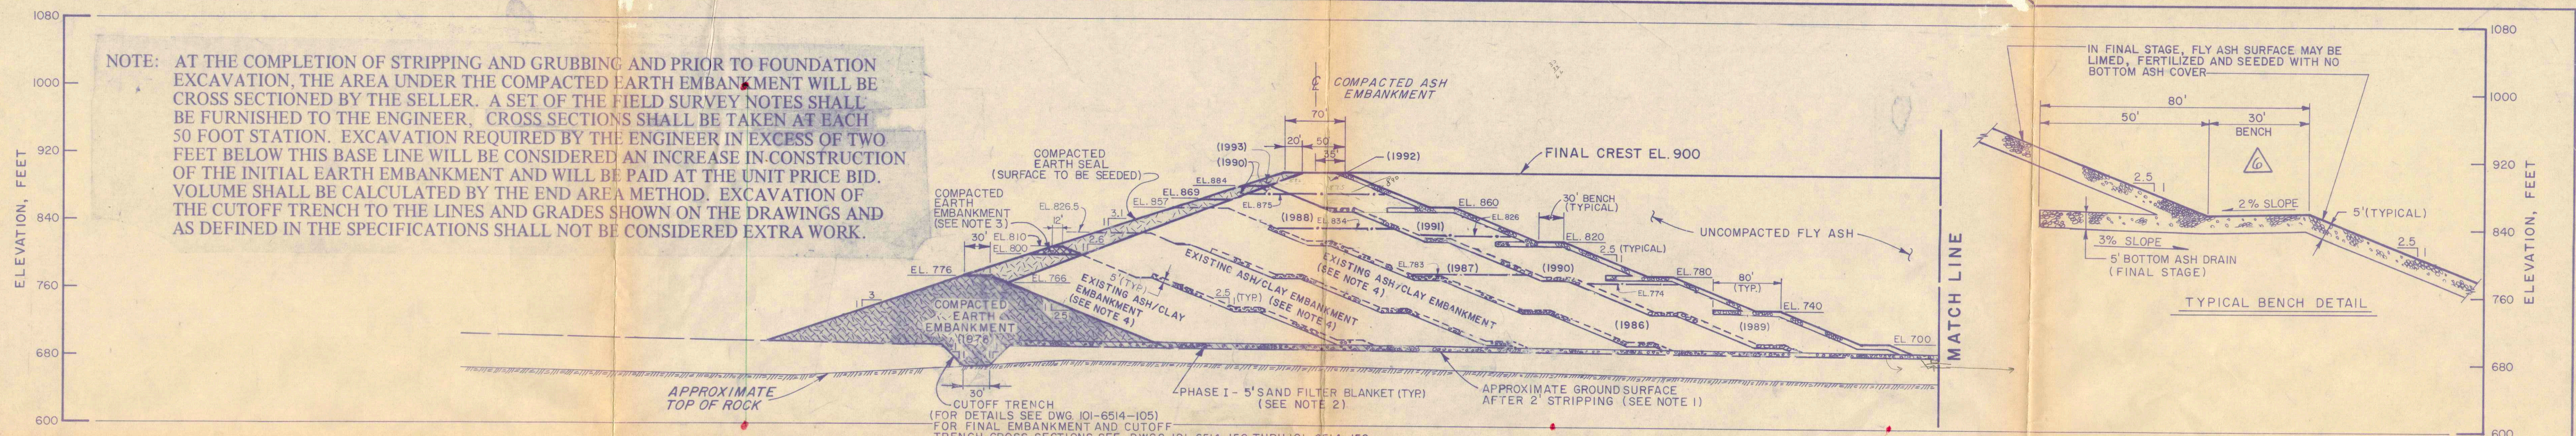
DETAILED PLAN OF COMPACTED ASH EMBANKMENT AND INITIAL EARTH EMBANKMENT
